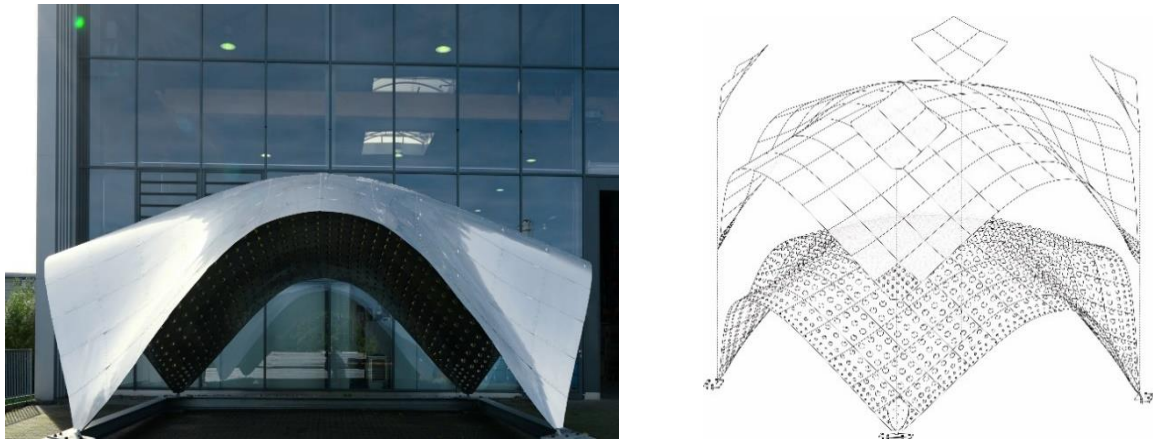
Prototype 2 based on smooth sheet-metal components.
